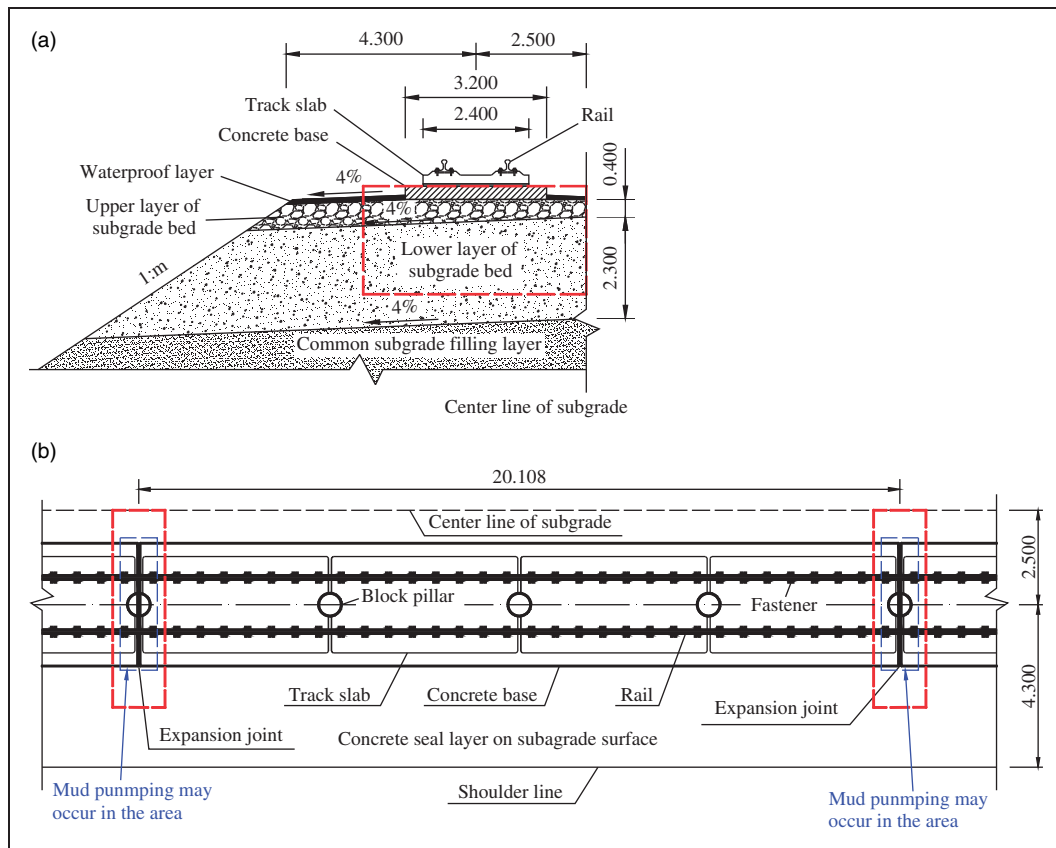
The structural characteristics of the slab track-subgrade (unit in m): (a) the cross-sectional profile of the slab track-subgrade; (b) the plane section of the slab track-subgrade.
